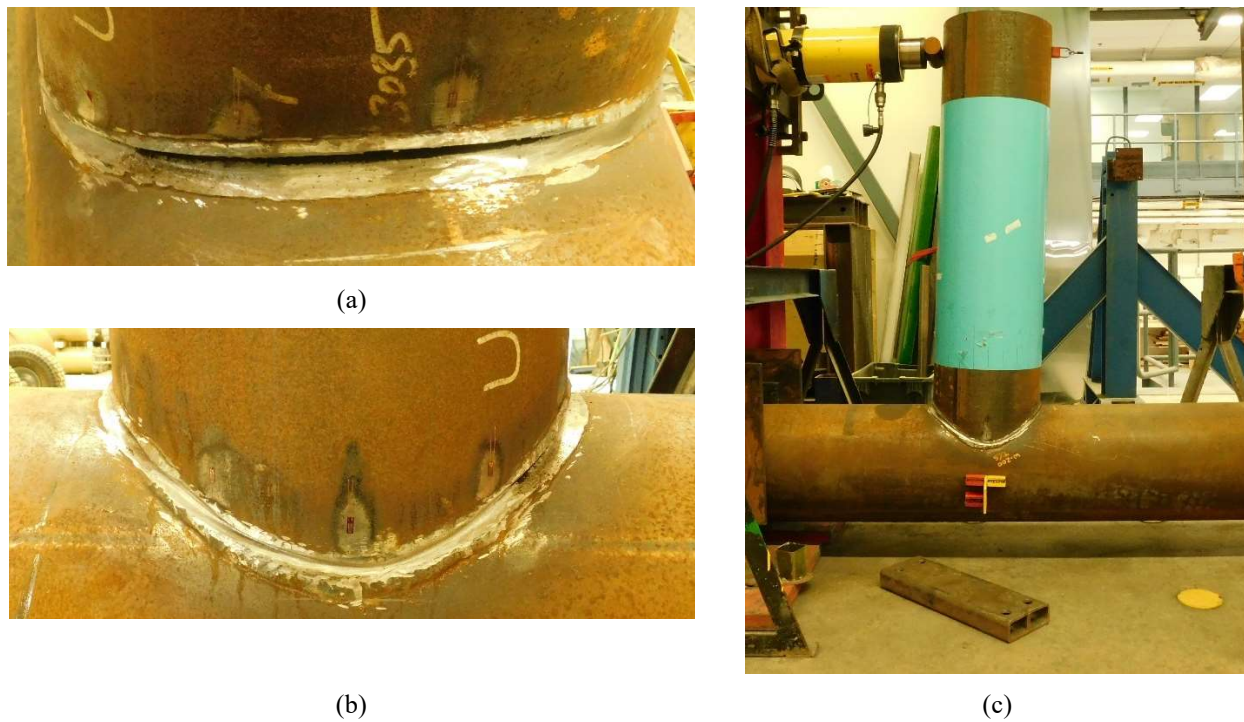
Failure of T356-324-1P (a) weld fracture, (b) chord deformation and (c) branch deformation
